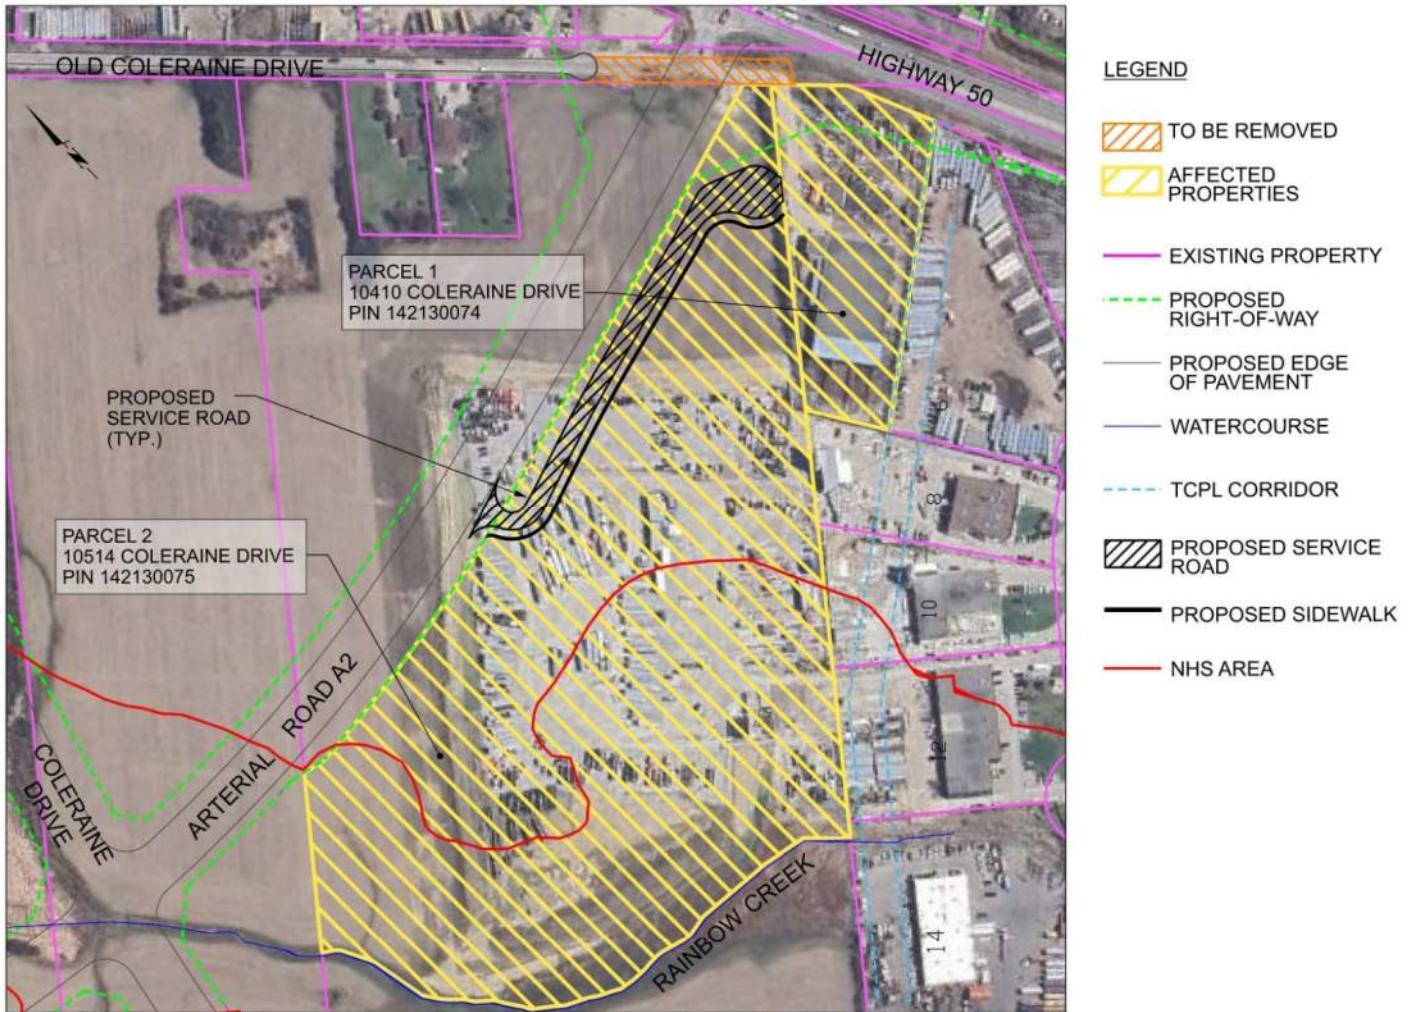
Options 4A & 4B Conceptual Layout of a Service Road with Left-In, Right-In and Right-Out Access to Arterial Road A2
